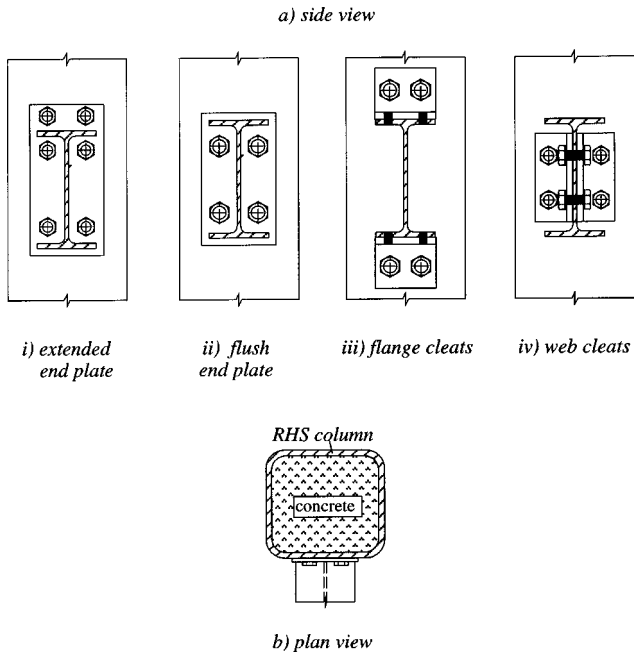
Typical joint between I-beam and concrete-filled rectangular hollow section
